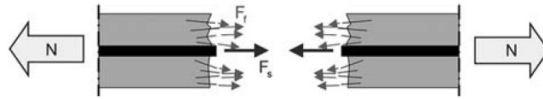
External and internal force equilibrium at crack cross-section under tensile load.
